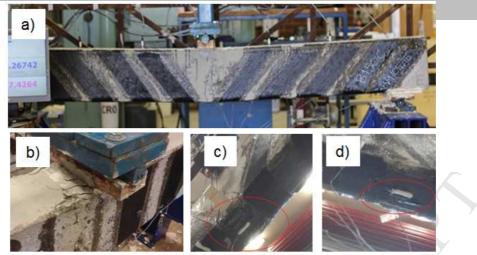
(a) Failure mode of Beam B150C; (b) Compressive failure of concrete at loading plate; (c) Complete BFRP rupture at mid-span; (d) Partial BFRP rupture at SGE3
